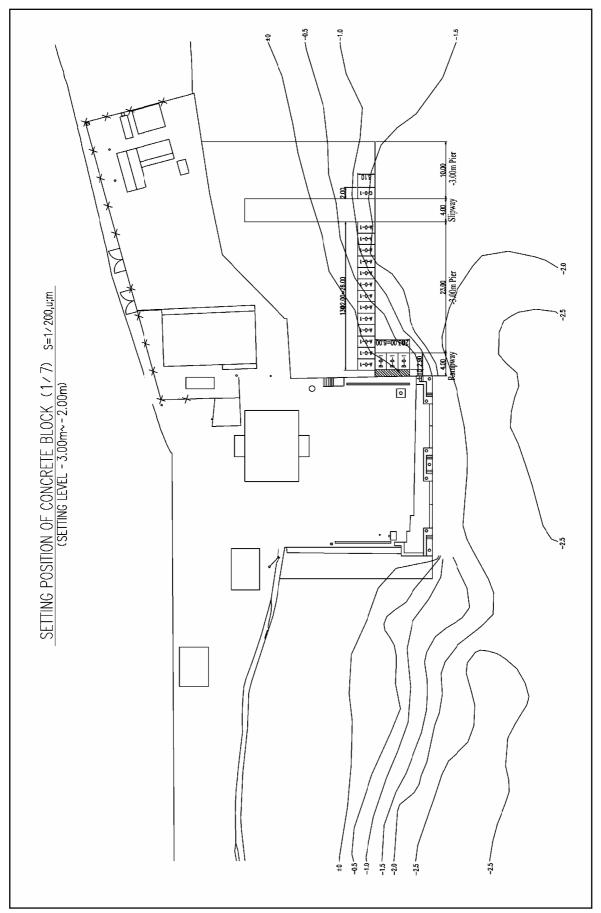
Setting Position of Concrete Block 1st Layer (Elevation Level of Foundation)
